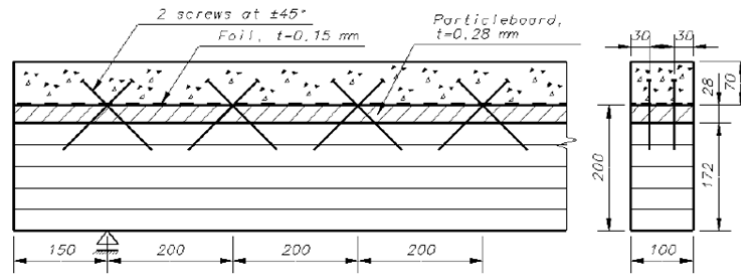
timber-concrete connection with crossed screws (after Van der Linden 1999) (dimensions in mm)
